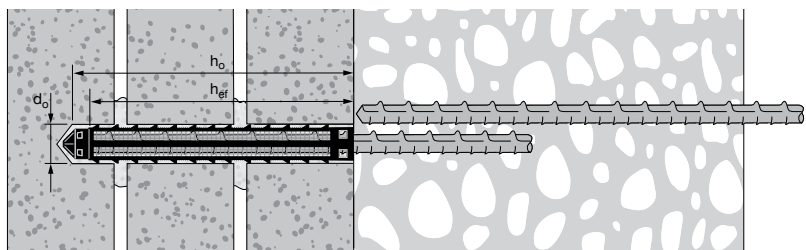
HIT-HY 70 specifications for rebar in multi-wythe brick wall
